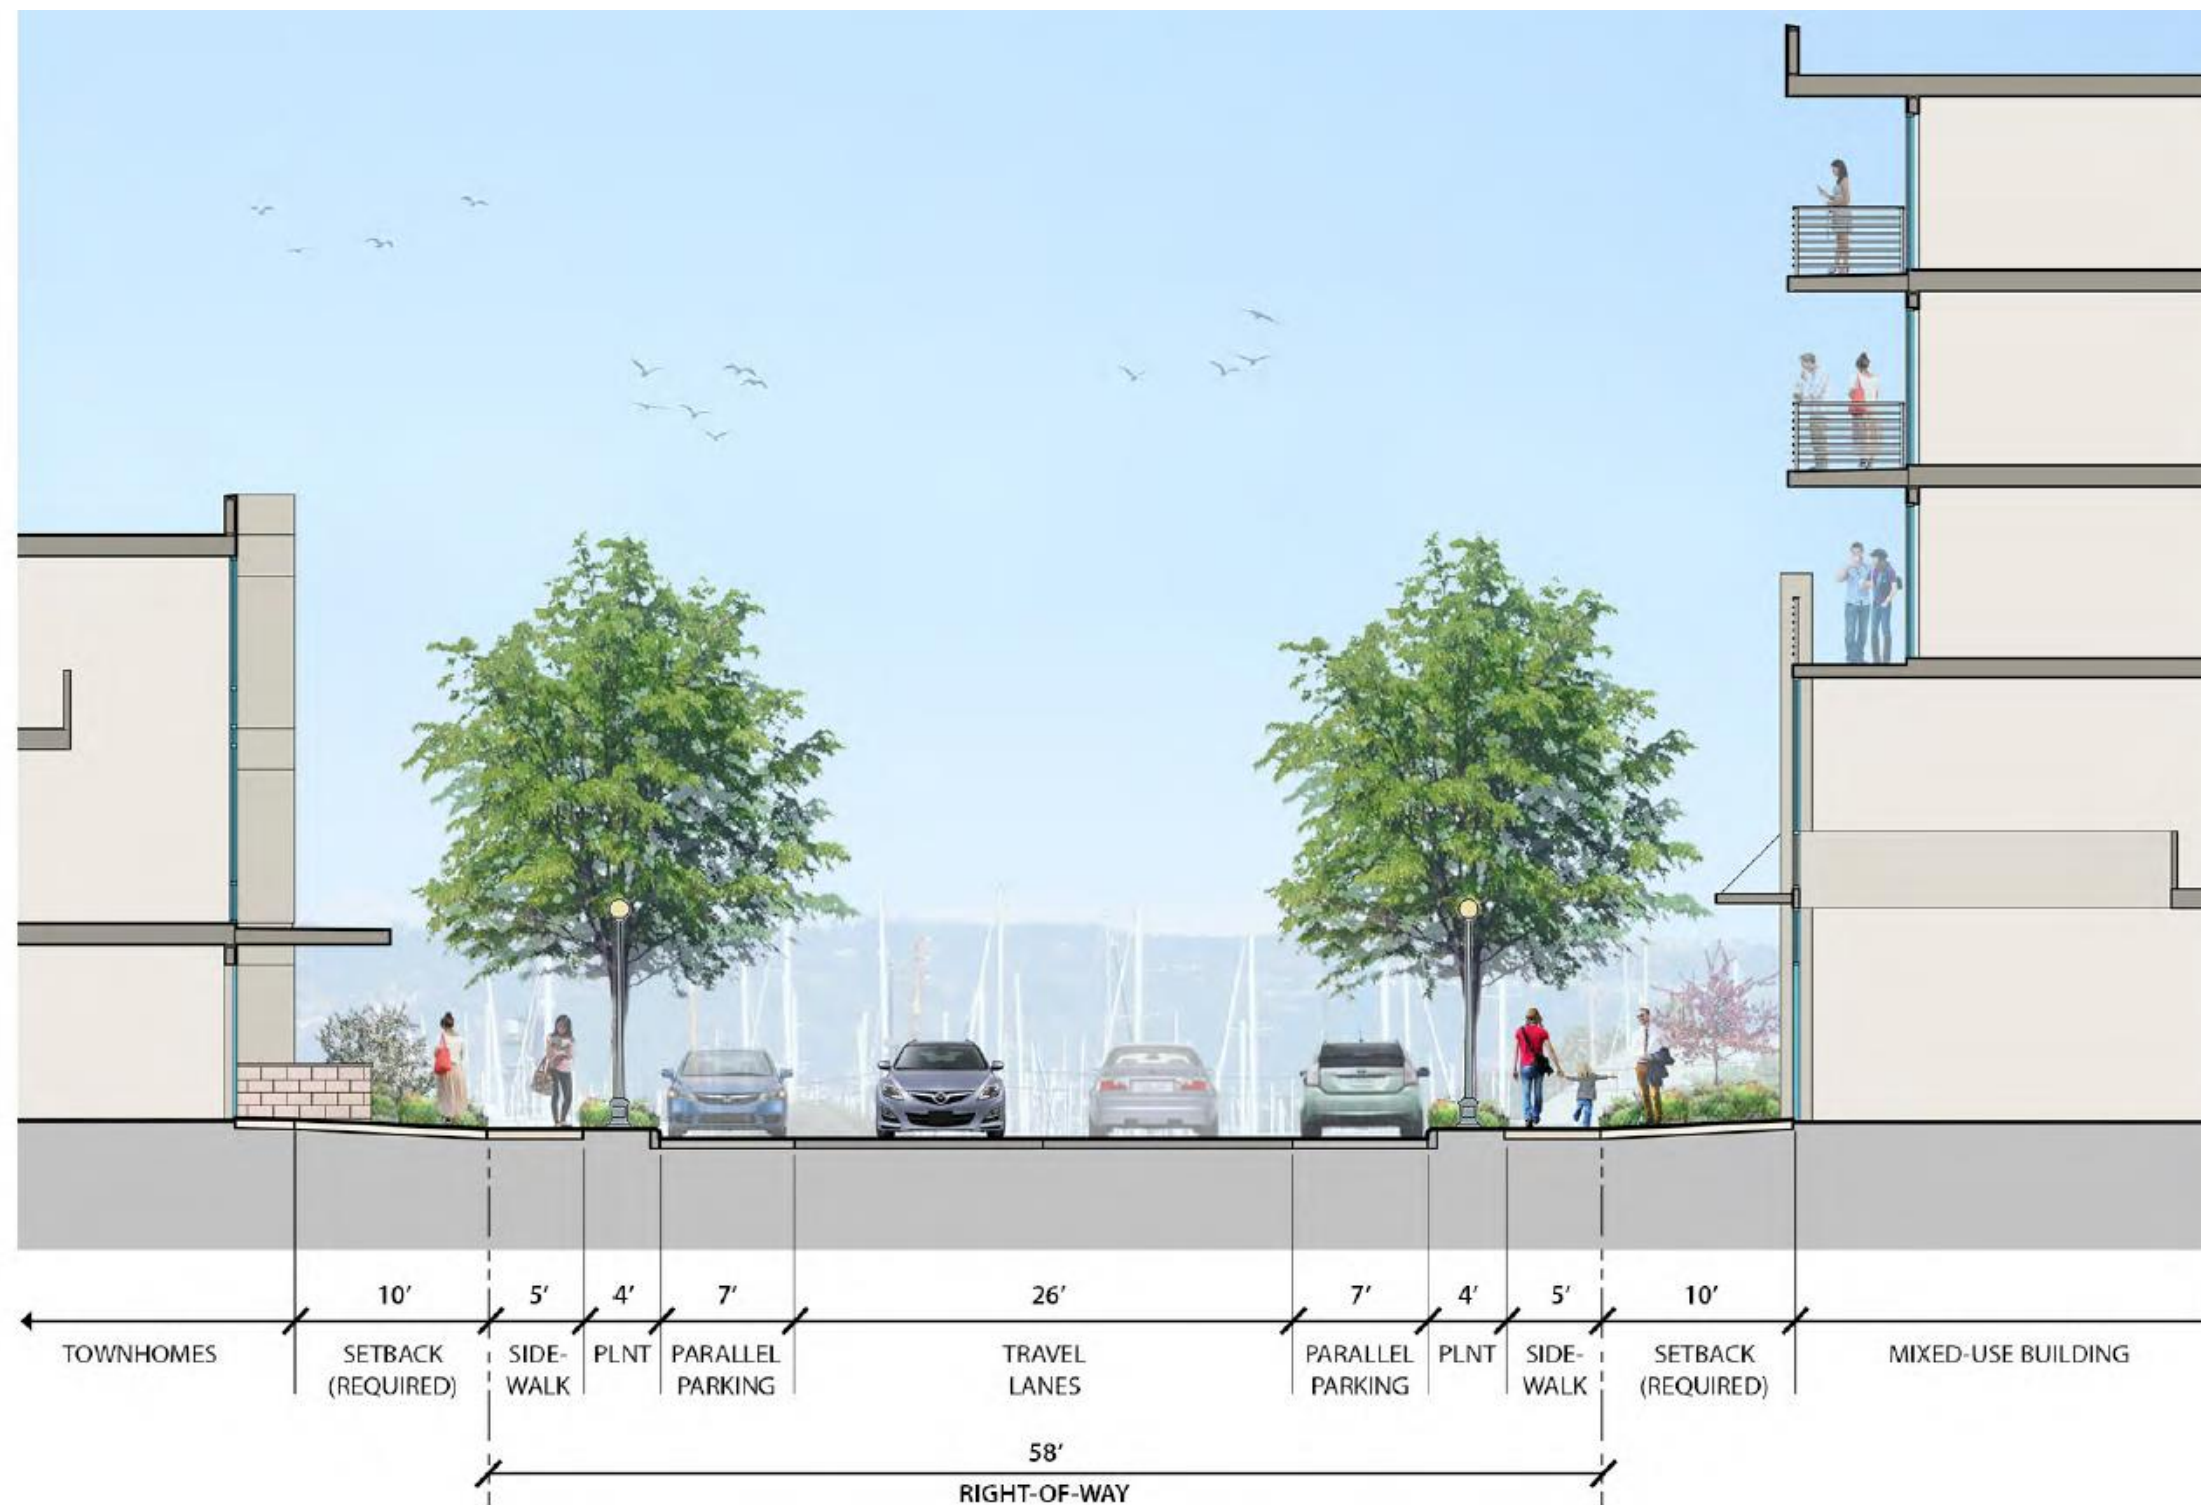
ILLUSTRATIVE CONCEPTUAL CROSS-SECTION H- INTERNAL STREET EAST ENTRY ROAD
